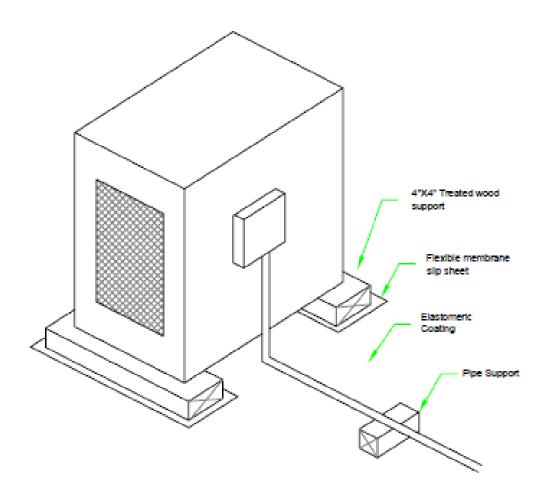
RAISED CURB DETAIL (JOB SITE CONSTRUCTION WOOD CURB)
